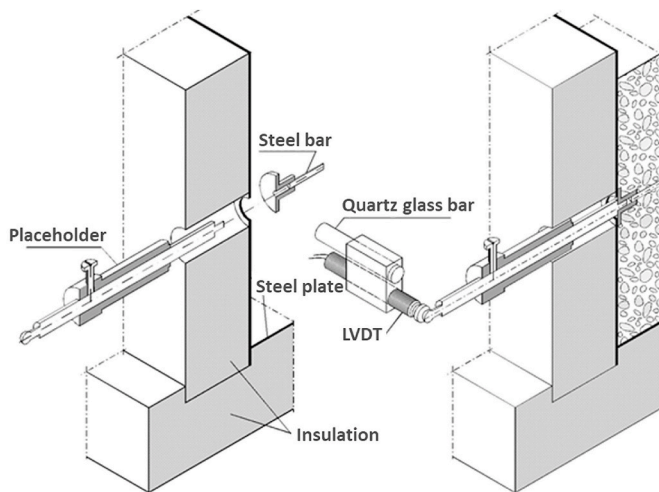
Installation of measuring bars and placeholders before casting (left) and installation of LVDTs when the concrete is stiff enough to support the bars (right), after [34].
